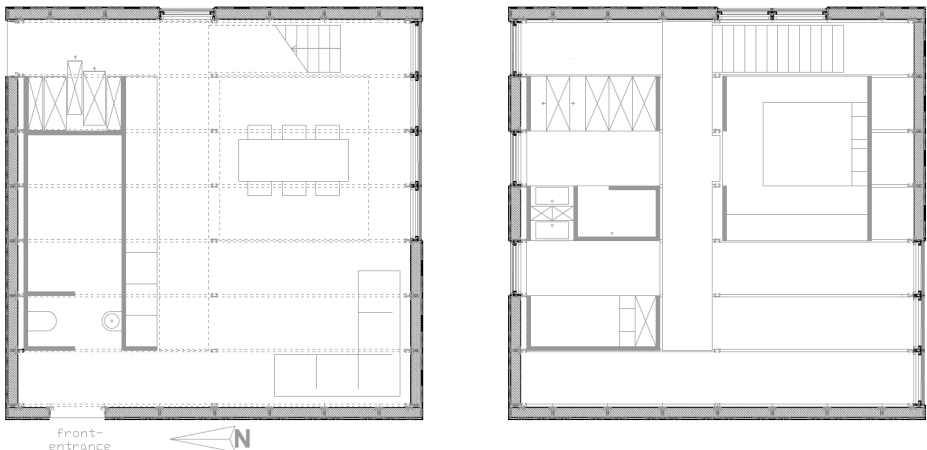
GROUND FLOOR (LEFT) AND FIRST FLOOR (RIGHT) OF THE E\_CUBE (TEAM-BELGIUM)
